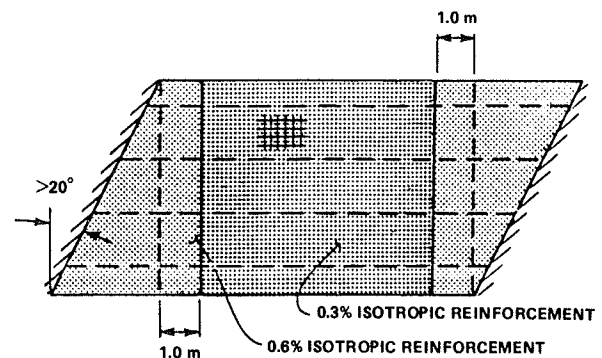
Reinforcement in deck slabs of skew bridges.
